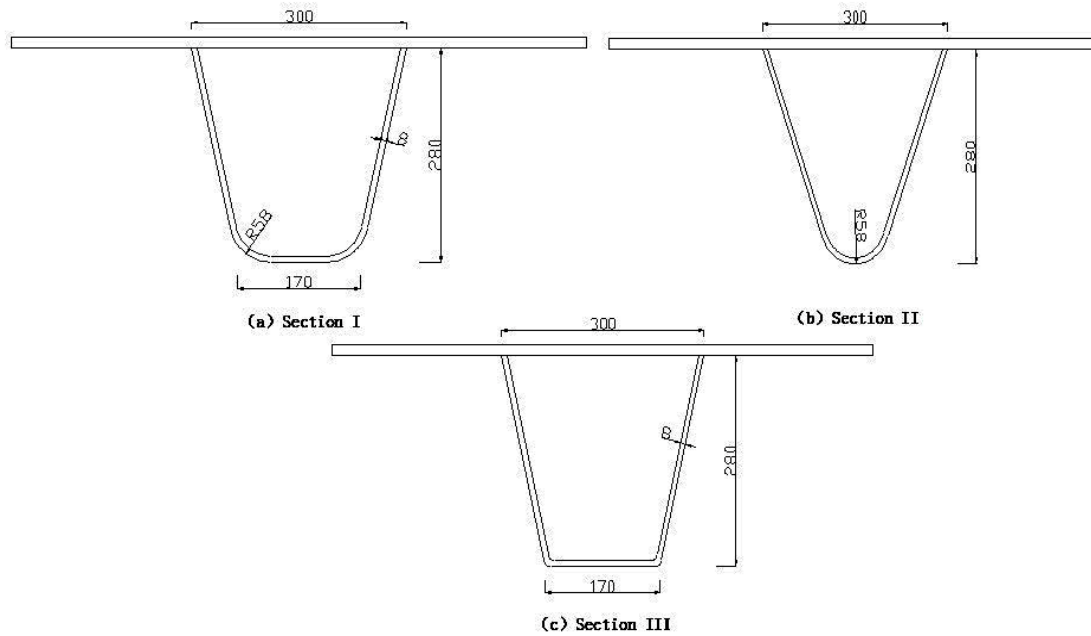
The Cross-Sectional Dimensions of the Longitudinal Stiffening Ribs [ mm]
